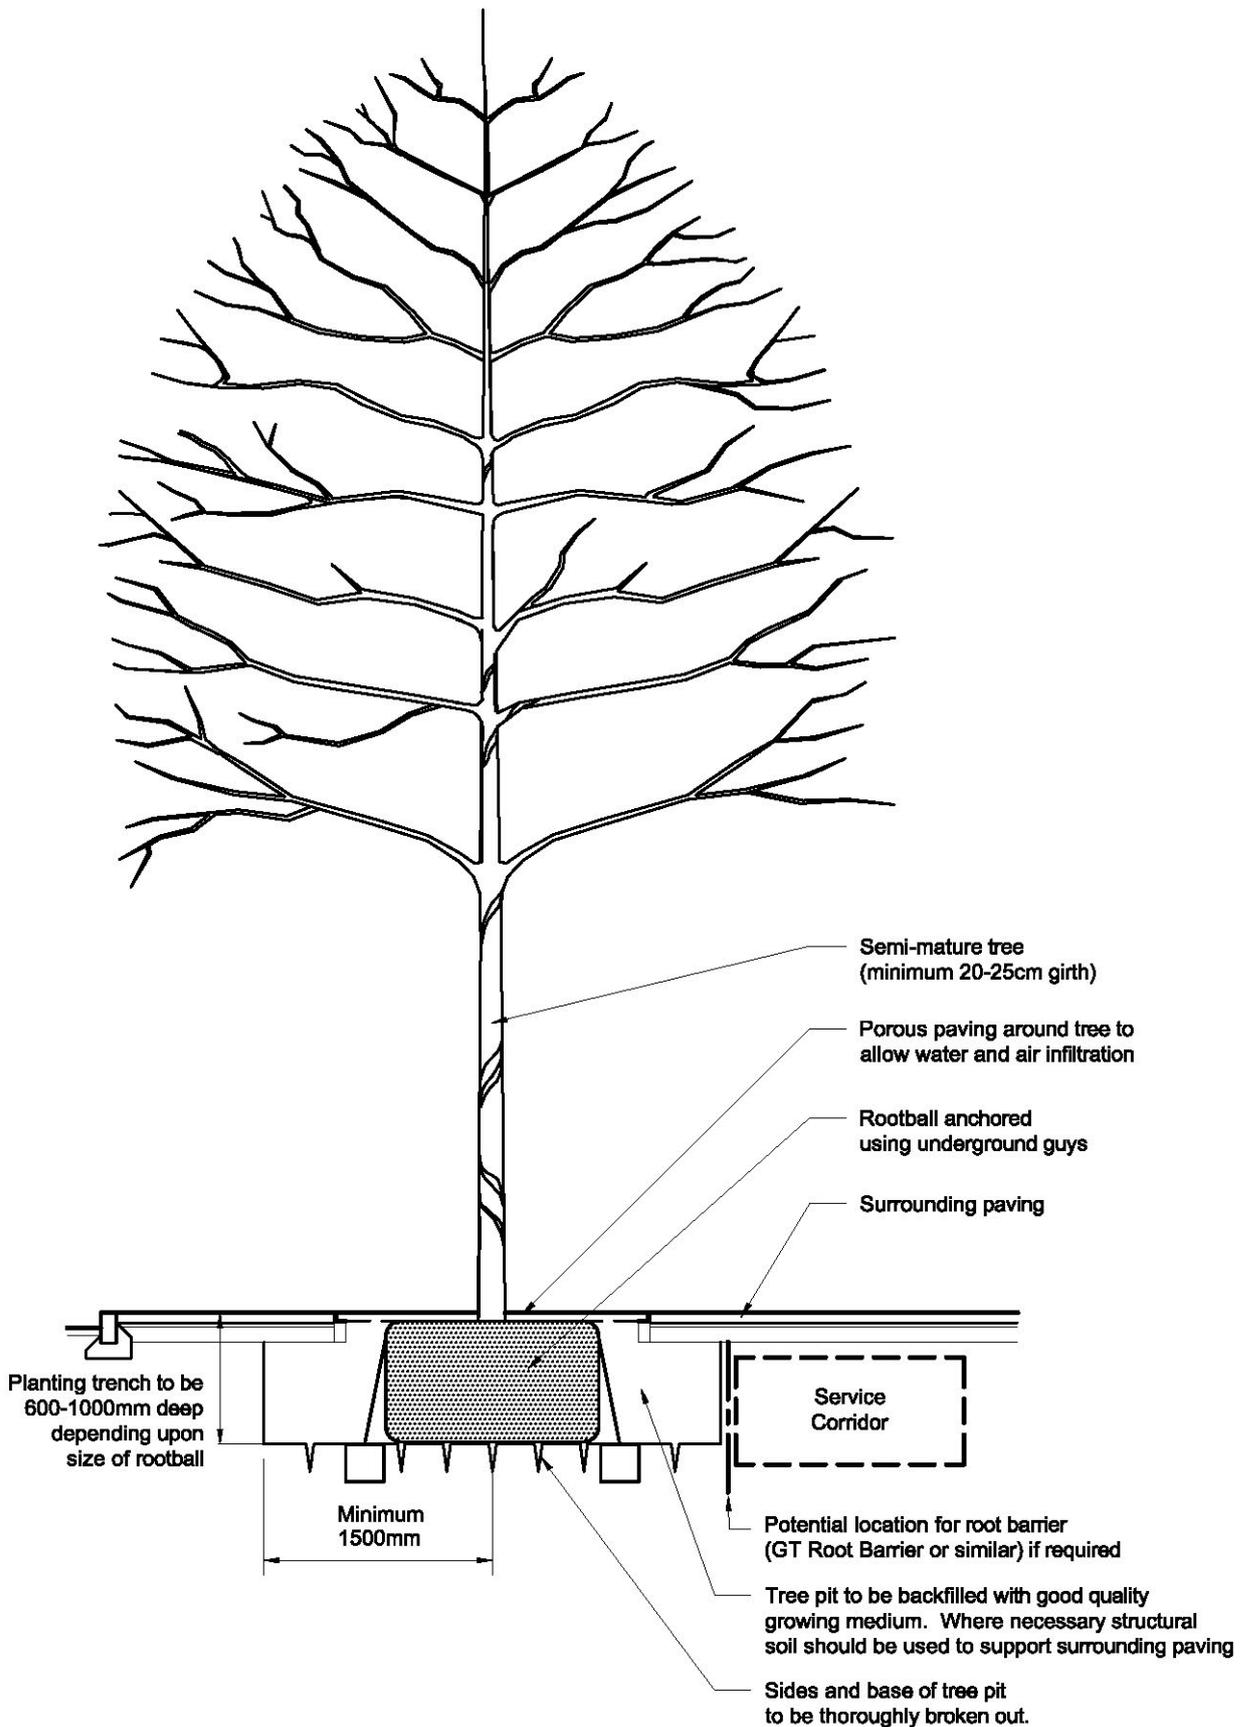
Good practice tree planting detail (showing service zone, porous paving, underground guys and good rootzone)
